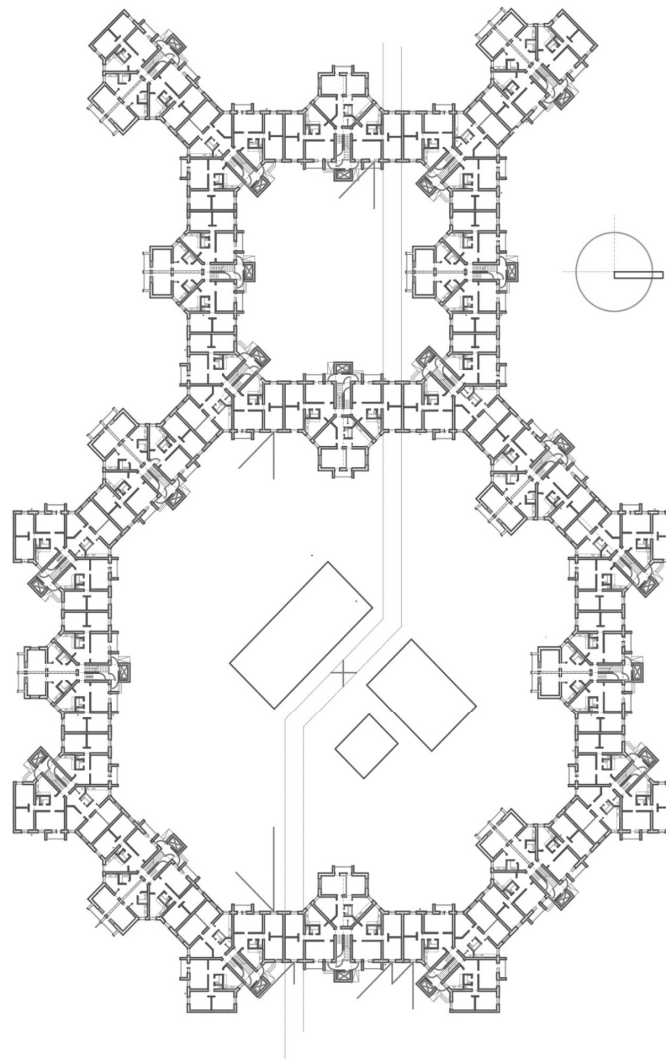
Residential grid structure development layout around existing buildings (Author's illustration).
